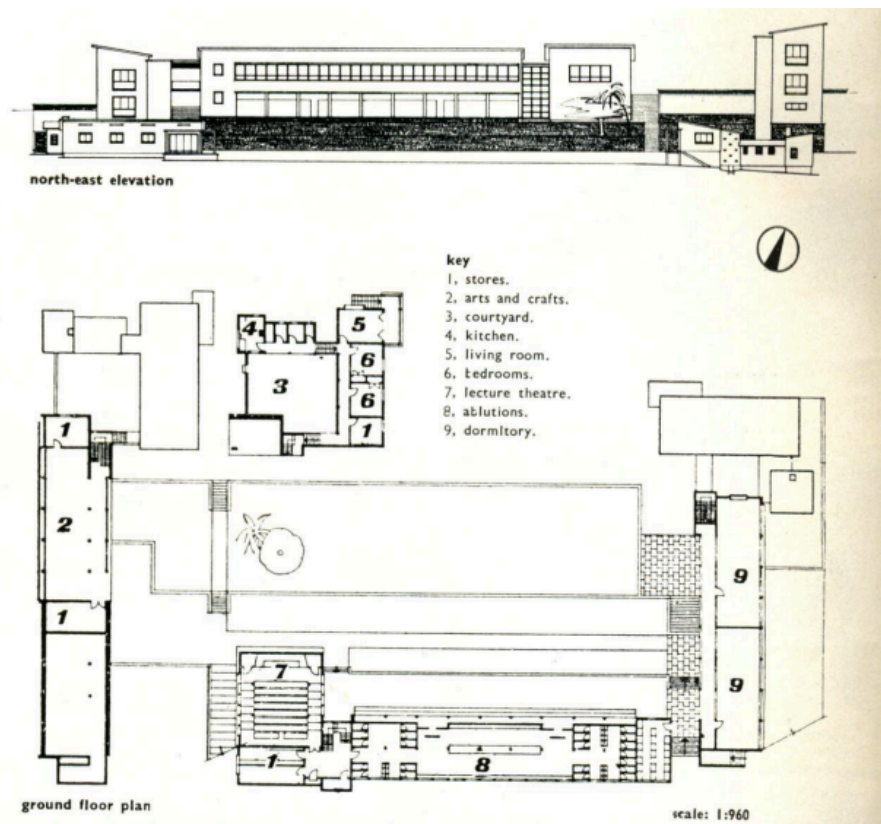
Elevation and Floorplan of Adisadel College¹³⁵
